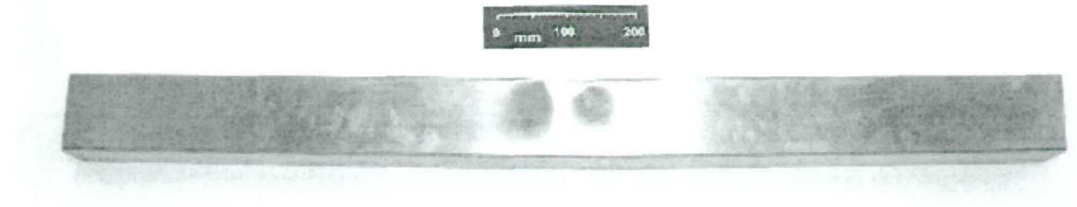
Elevation of deformed SHS 100×100×3 simply-supported beam
